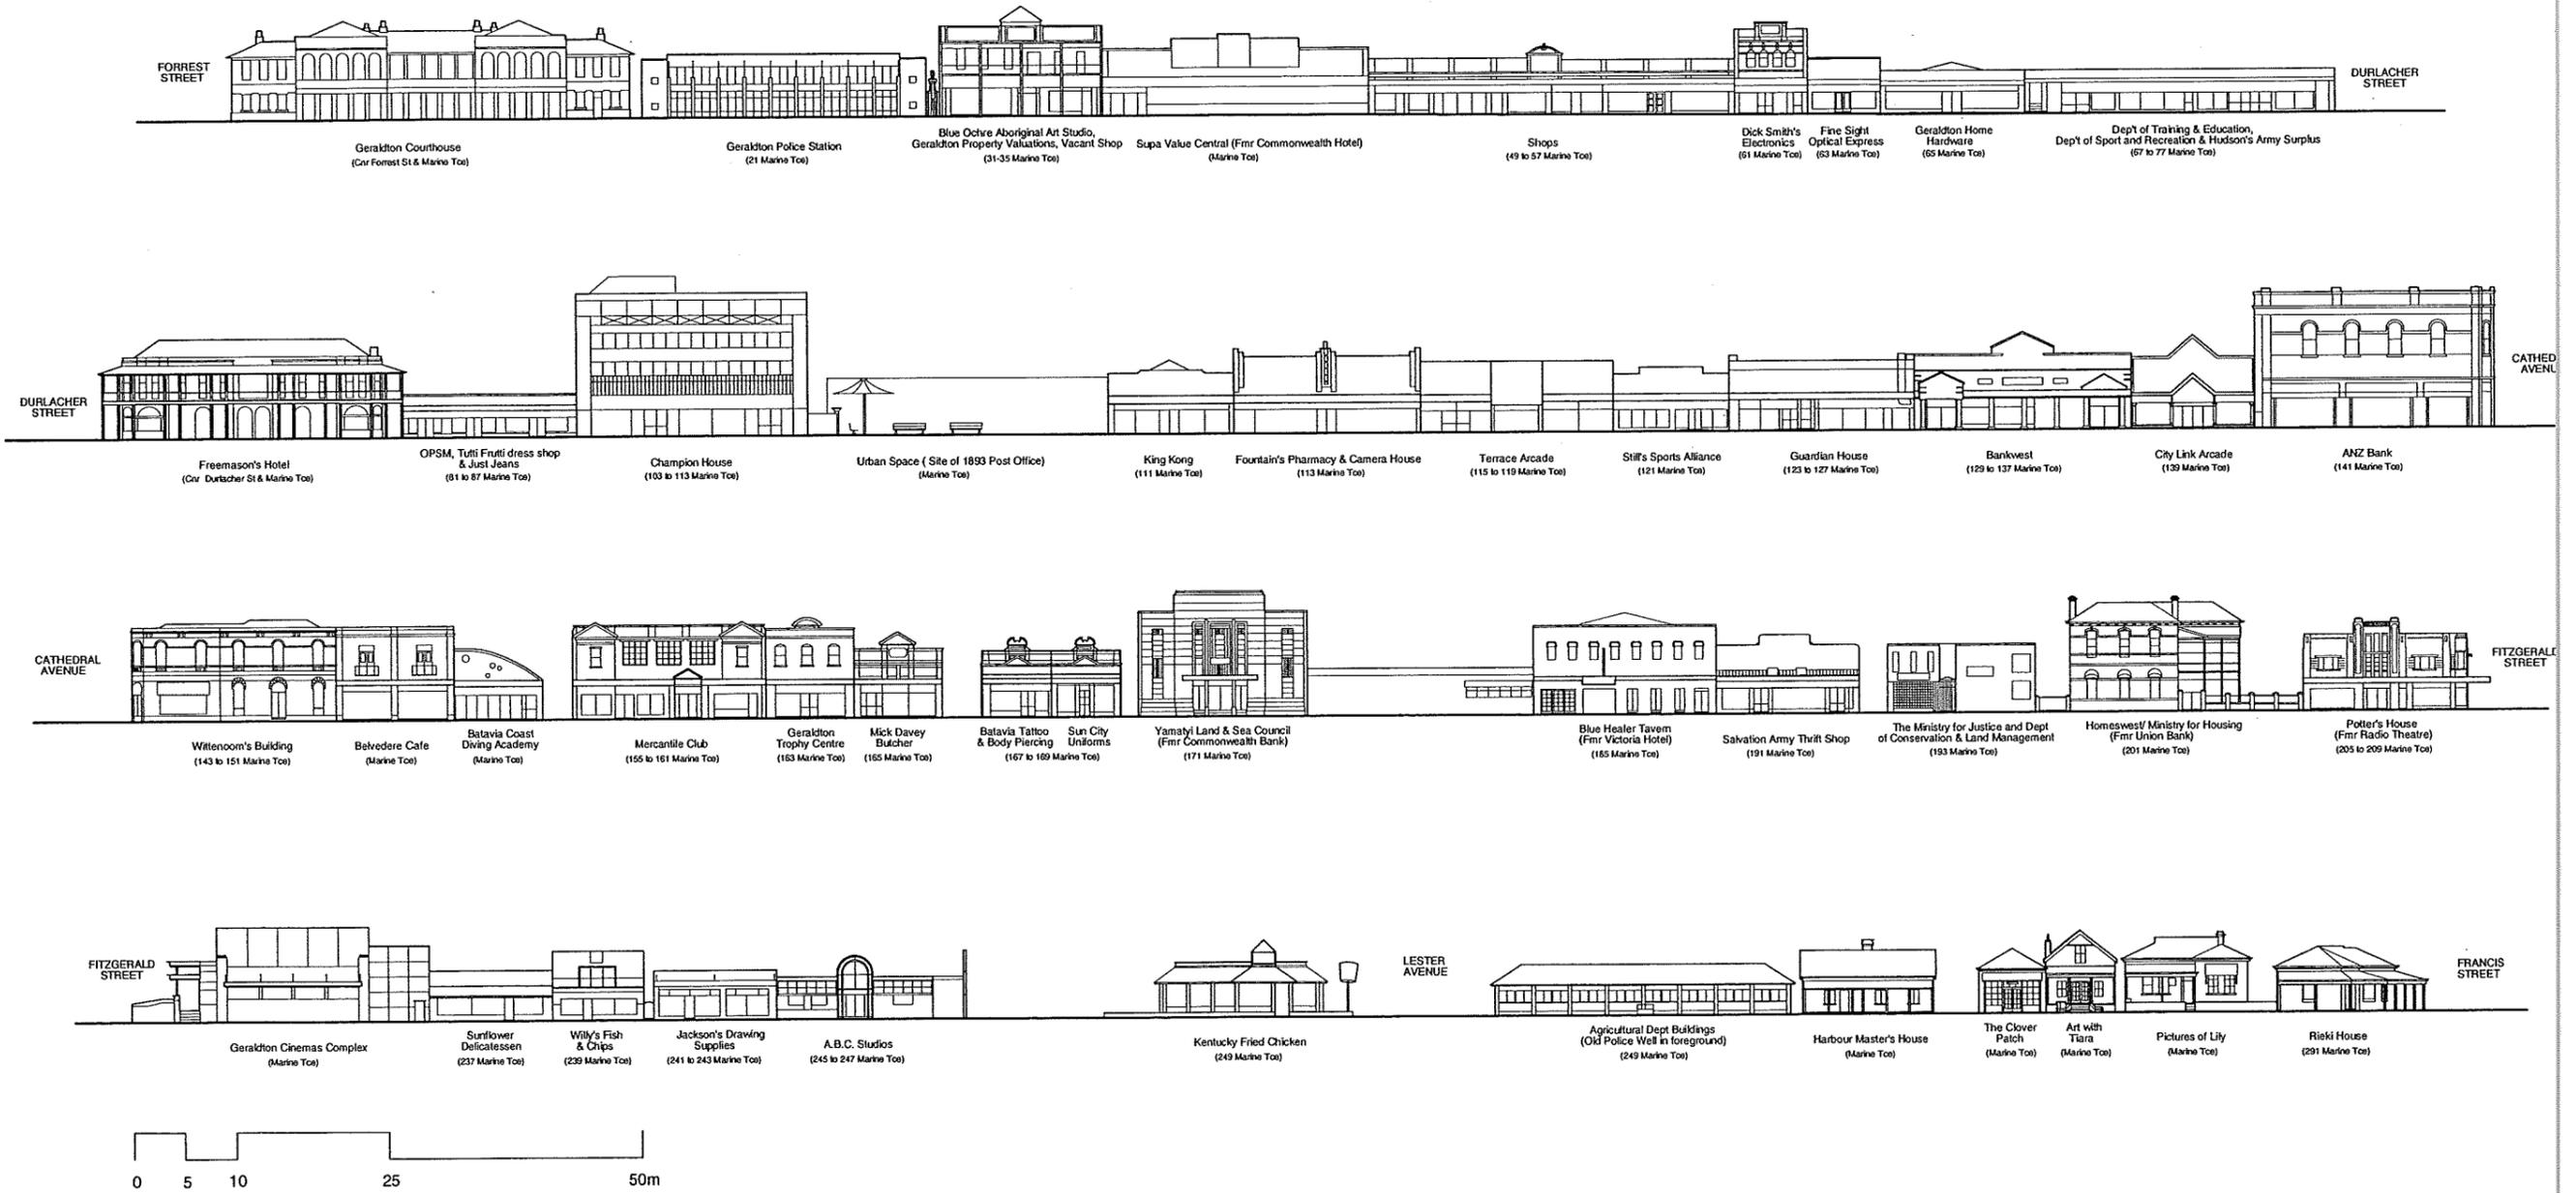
Marine Terrace Street Elevation looking south-east. Considine and Griffiths Architects. August 2002.
